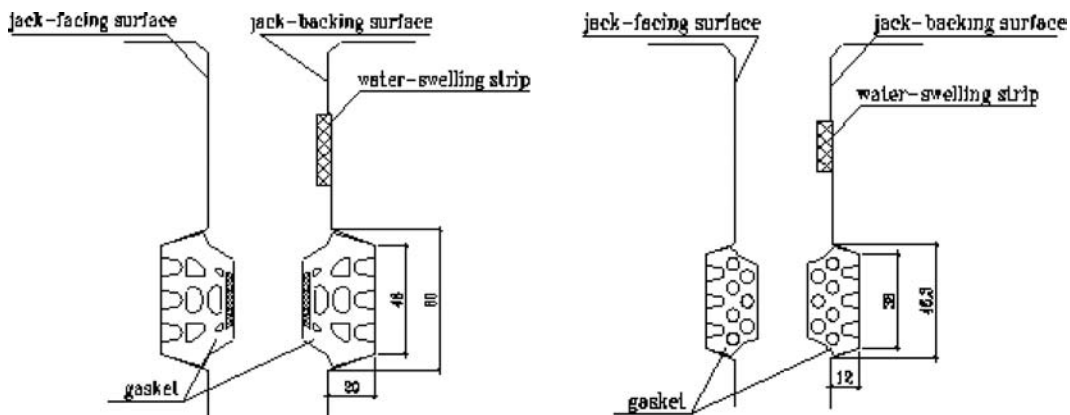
Water resistance of flexible rubber gasket and joint between double protection lines of sealing strip: (a) Initially de-signed gasket cross-section and groove dimension; (b) Optimized gasket cross-section and groove dimension.
